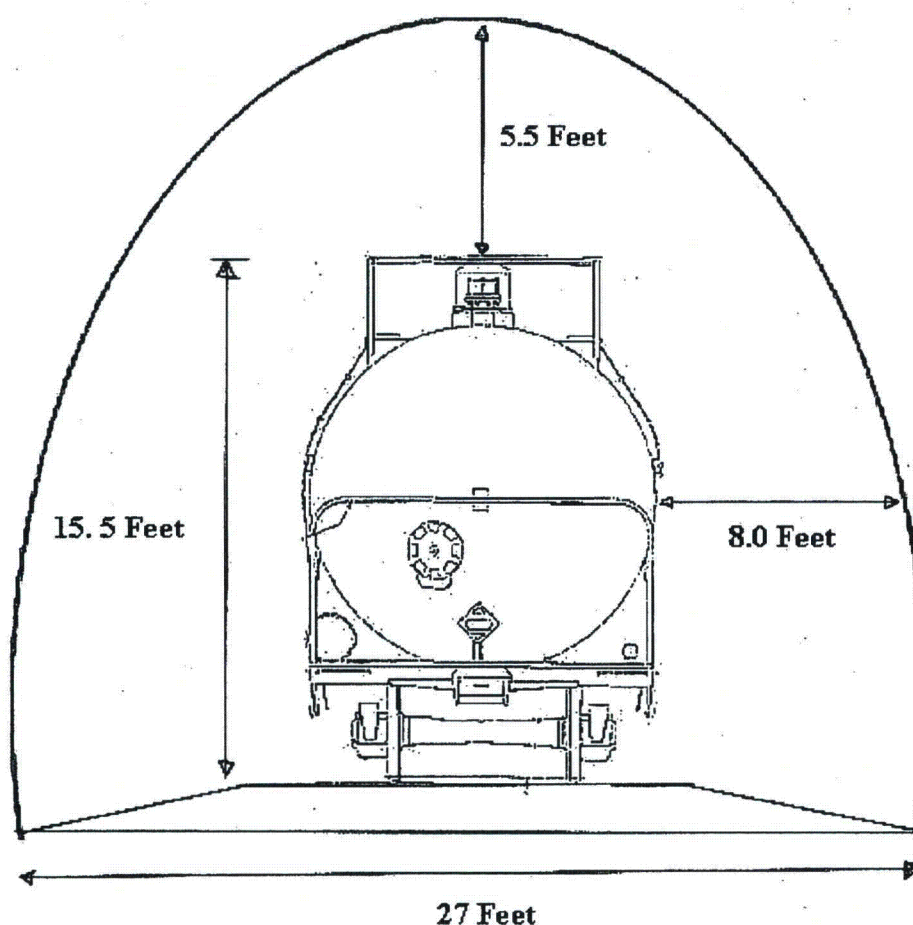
Dimensions of Howard Street Tunnel with Tank Car on Track
